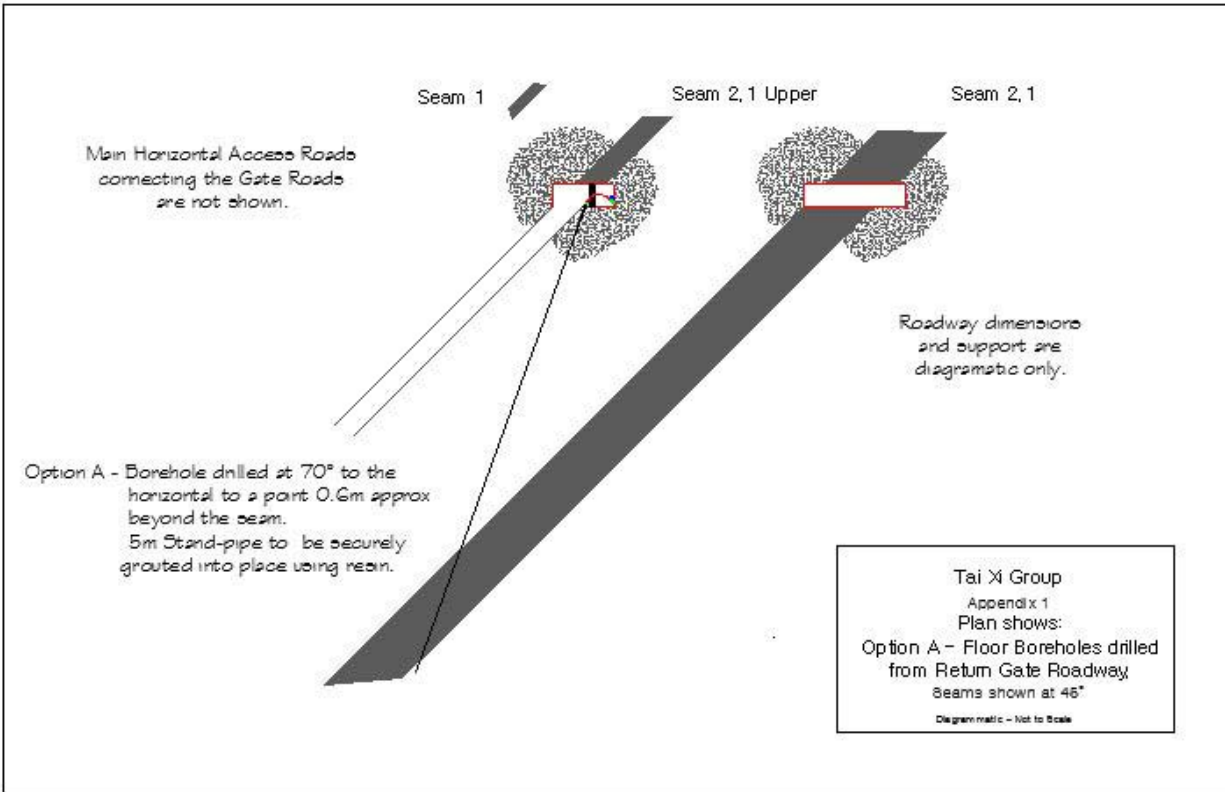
Drawing Showing Floorhole Design Drilled from Return Gate Road
